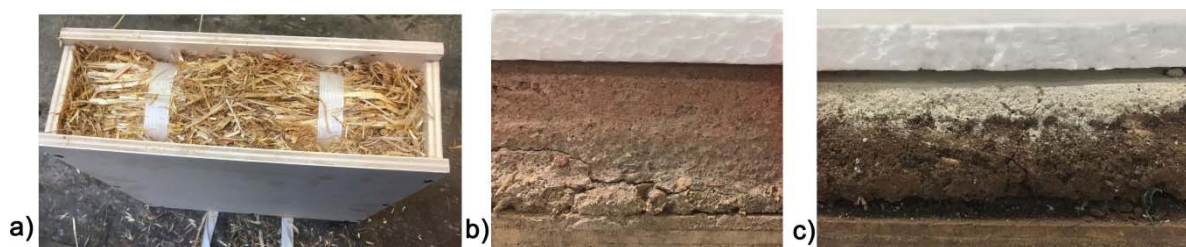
a) Construction of the plywood box filled with Straw (Sample type 2); b) Sample type 3: ‘Cocciopesto’ plaster with plywood panel and polystyrene; c) Sample type 4: Raw Earth plaster with plywood panel and polystyrene.
